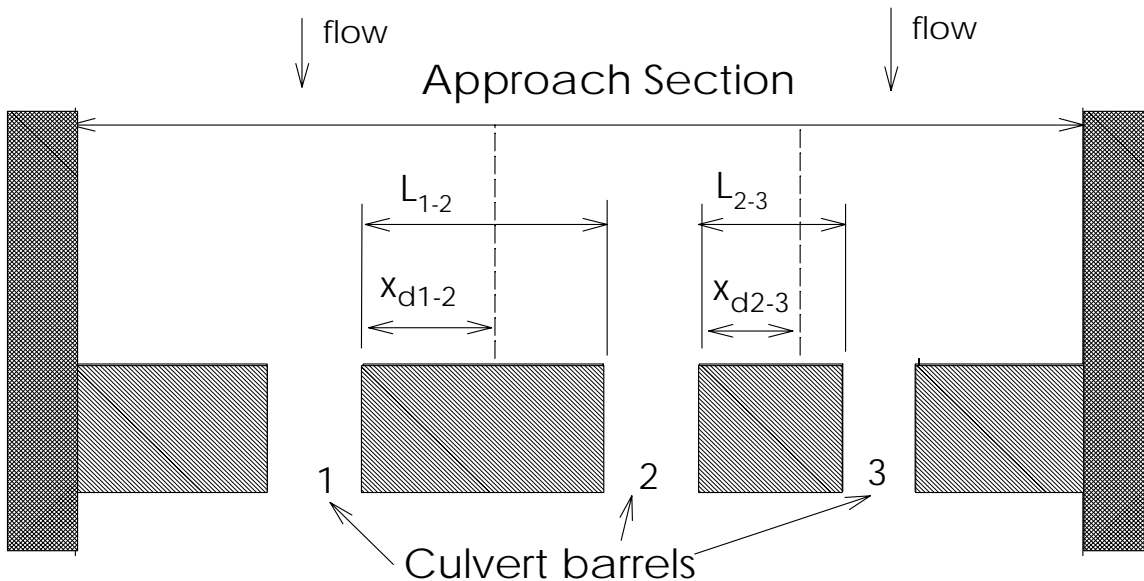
Location of dividing points on embankments for multiple culvert sections.
